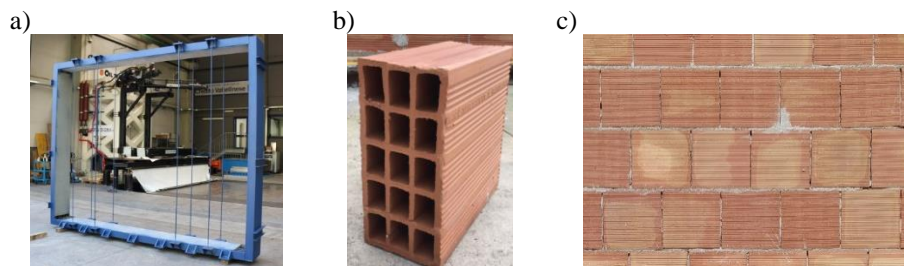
a) Steel concrete composite bare frame; b) Horizontally perforated units; c) poorly done head joints
